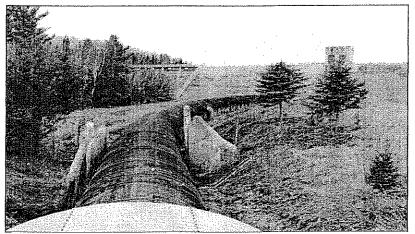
Victoria Dam (Built in 1991) and Wood Stave Penstock (Built in 1959)
